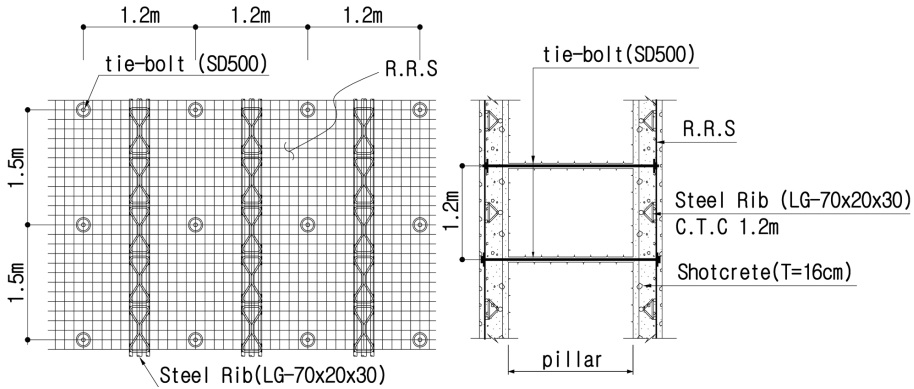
Layout of Tensioned bolts installed during excavation of following tunnel
